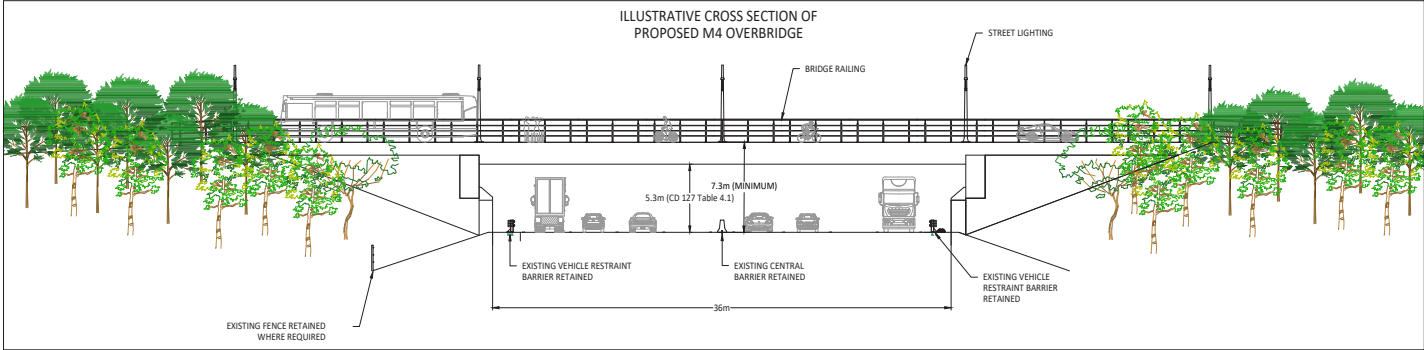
Primary Street Infrastructure - M4 bridge crossing
